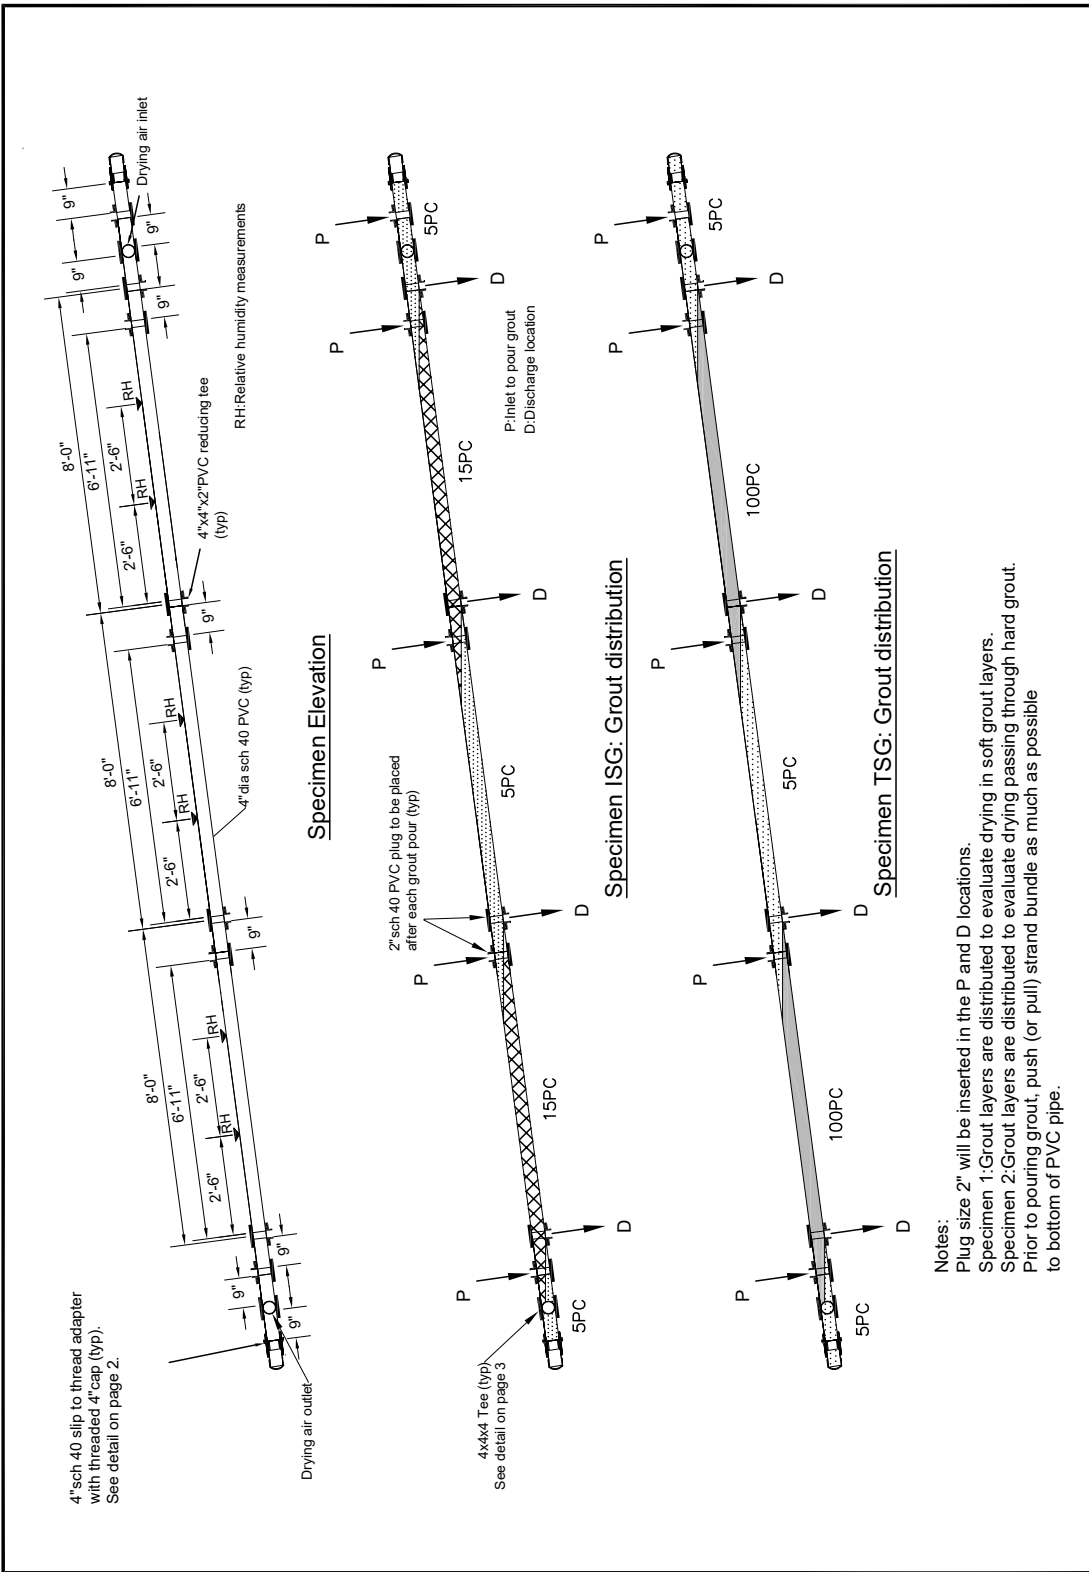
Drying of PVC specimens: grout layer distribution
